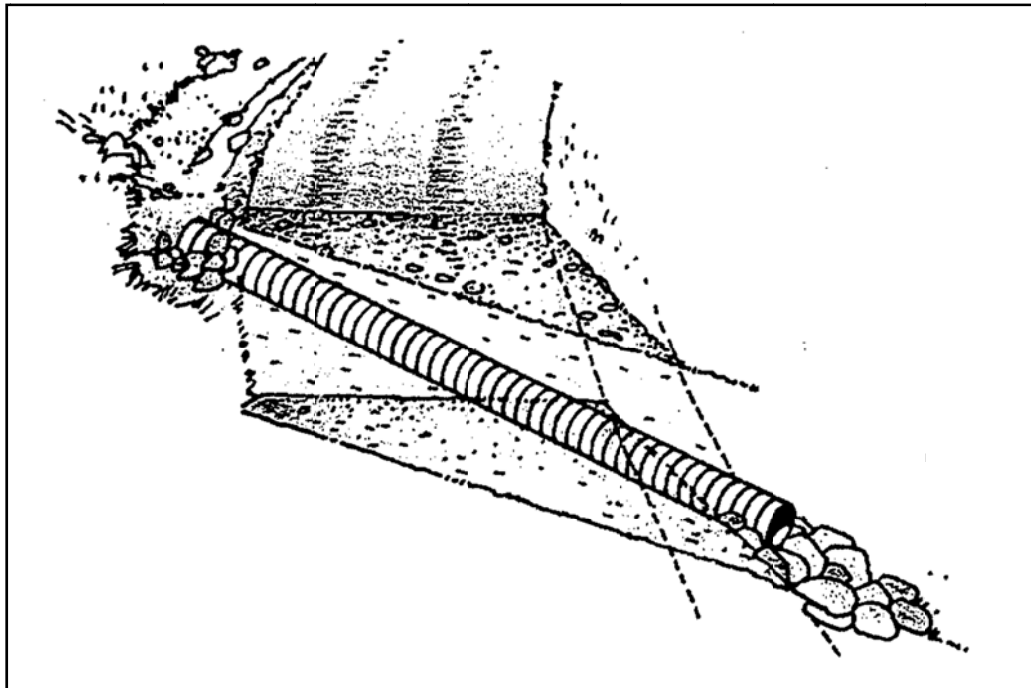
Like stream crossing culverts, ditch relief culverts should be installed at the base of the road fill, with armoring at the inlet and some type of energy dissipation at the outfall. If the culvert is placed higher in the fill, a downspout should be used to carry flow from the outlet downslope past the base of the fill.
